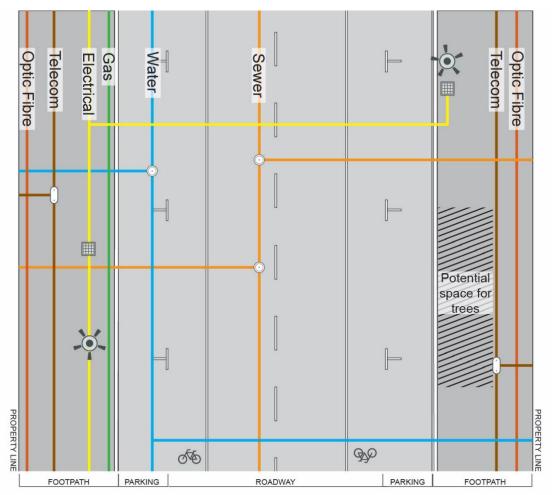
Diagram of typical underground services arrangement in roadways and footpaths with potential space for tree planting highlighted after all service authority regulations and guidelines have been considered. (S Rogers & T Roe)
